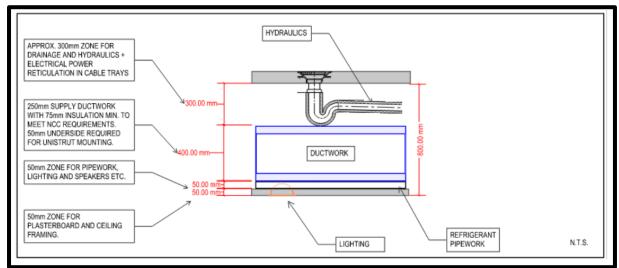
Typical Ceiling Service Coordination showing 800mm finished ceiling space.
